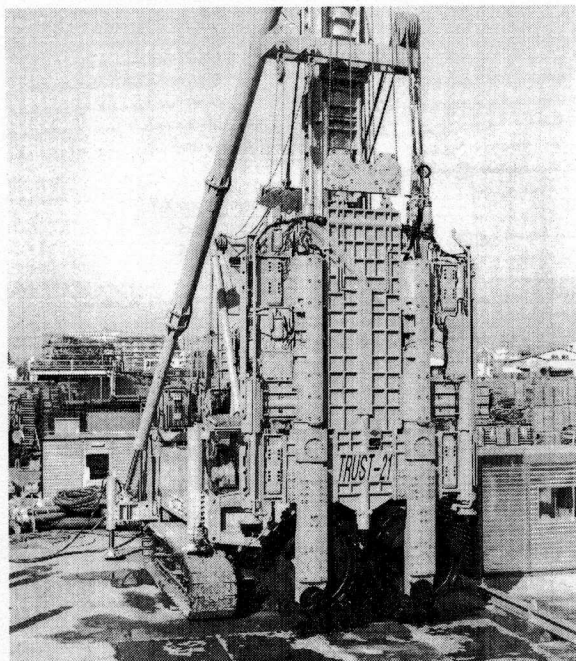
Photo and Structure of TRUST-21 Excavator
